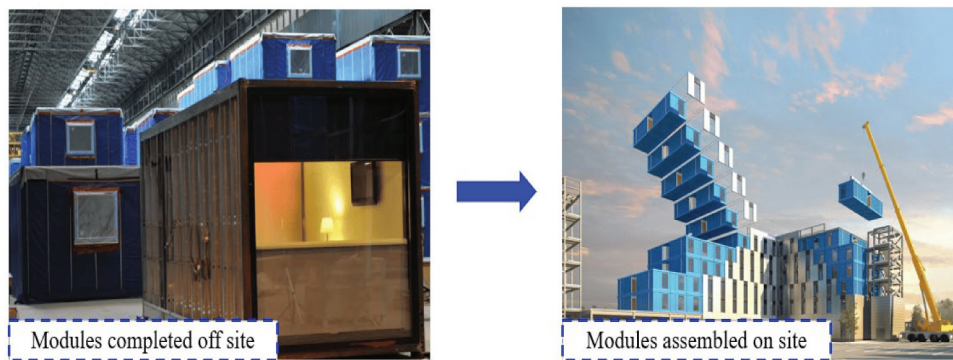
Construction of modular steel (Adopted from Yang et al. 2023).
